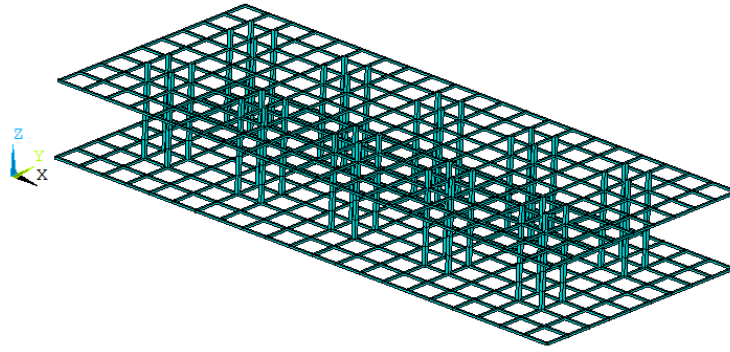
Vertical steel anchors and horizontal steel mesh in FE model
